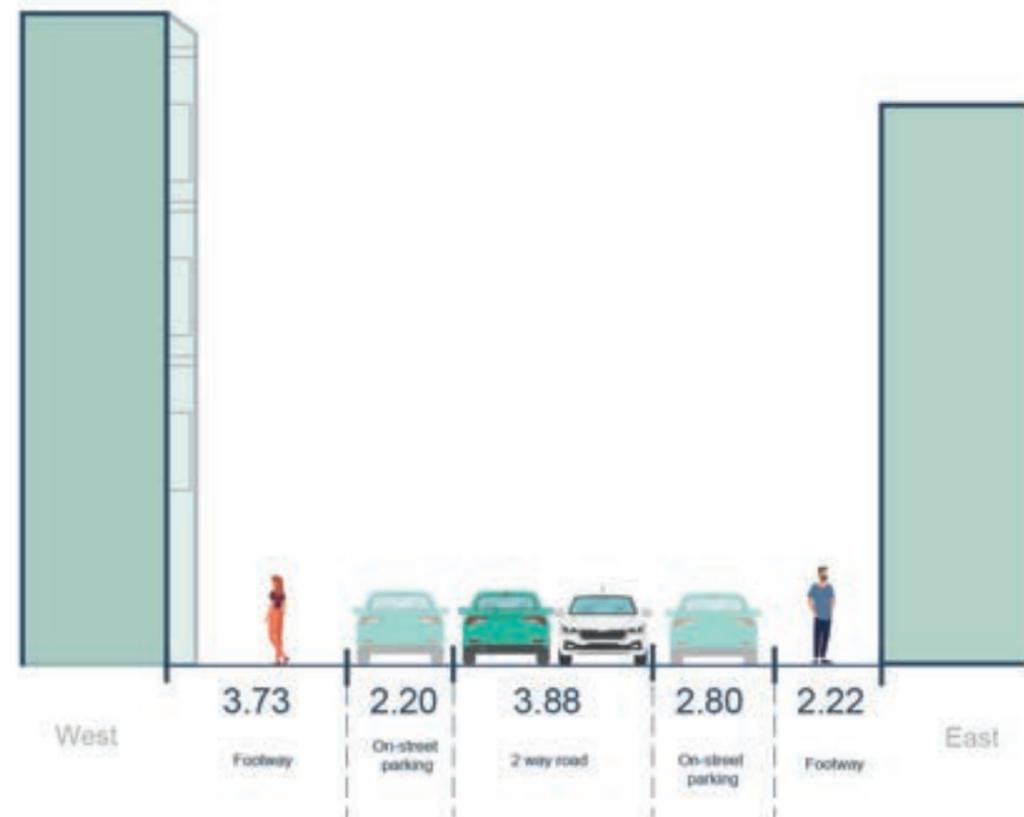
Existing street section of Charlotte between John Street and Maberley Street
